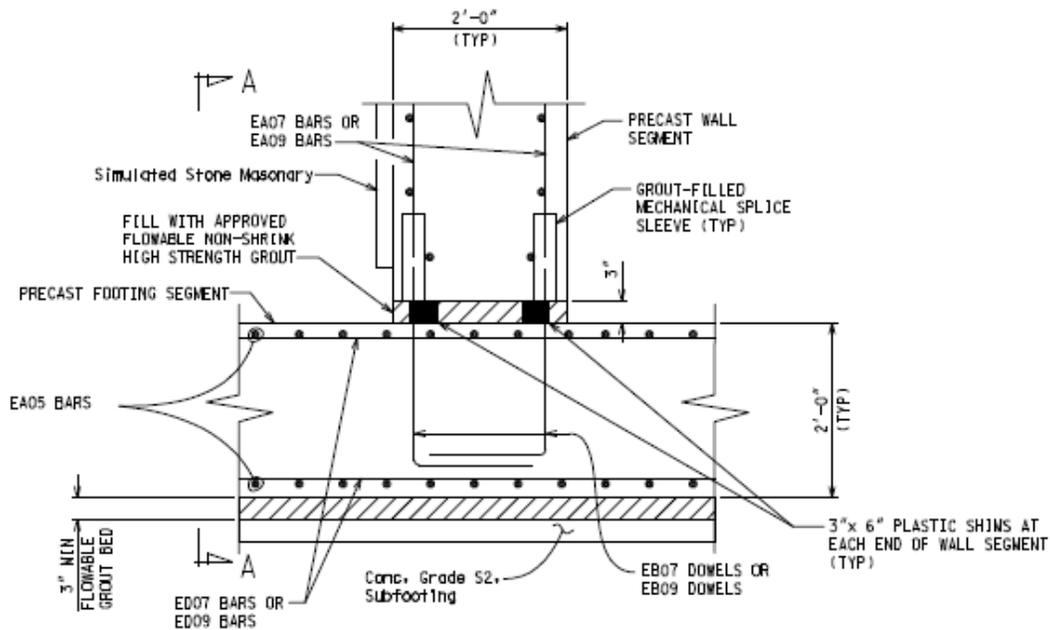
Typical Wall Segment-to-Footing Segment Connection
